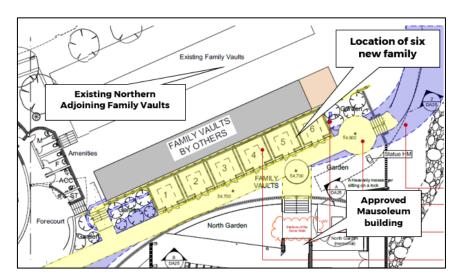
Location of New Family Vaults showing proposed building footprint Source: Gardner Wetherill Associates
